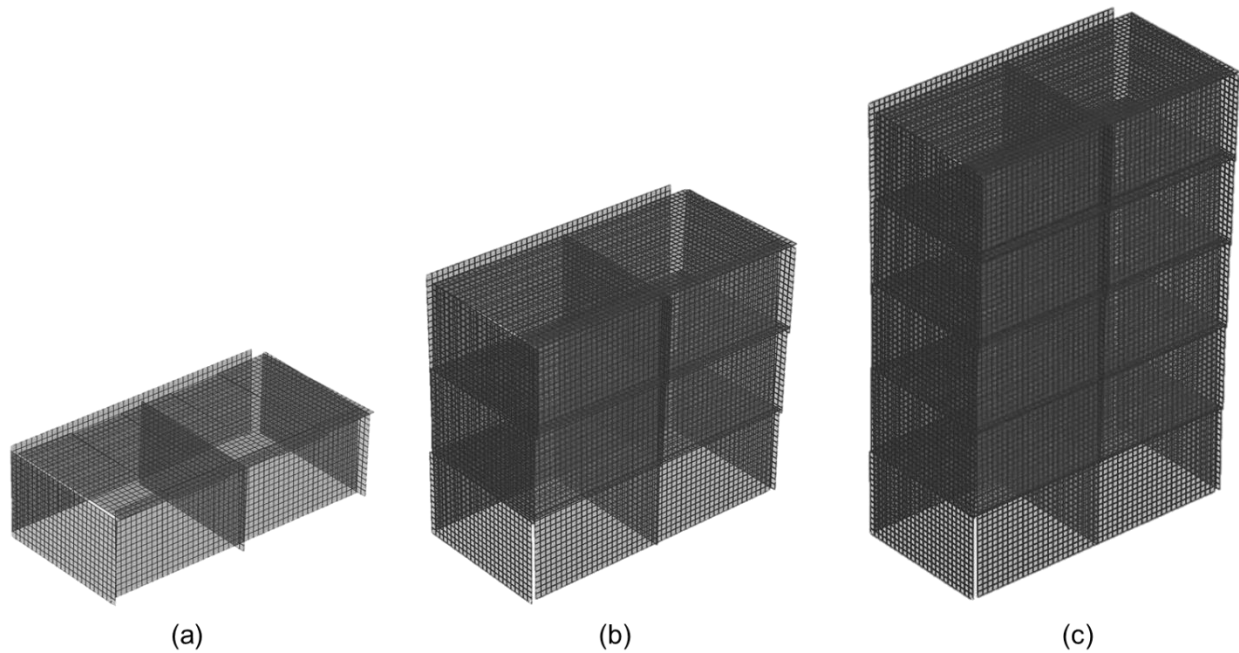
Deformed configuration of the numerical model of the CLT platform archetype: (a) single-storey, (b) three-storey, (c) five-storey.
